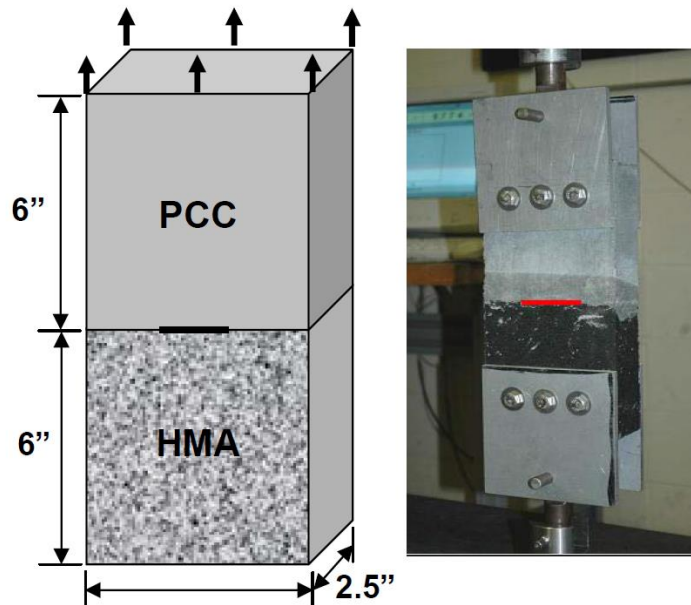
Sample specimen and test layout of modified tensile experiment [30]
